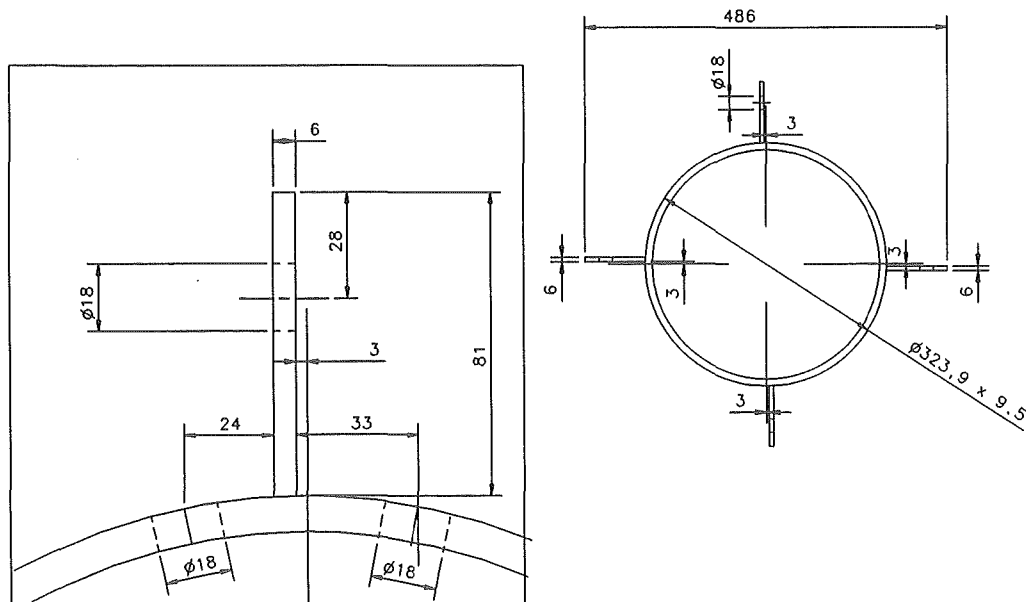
Specific details of web plate welded to columns (typical) for specimens 4C1 to 4C4
